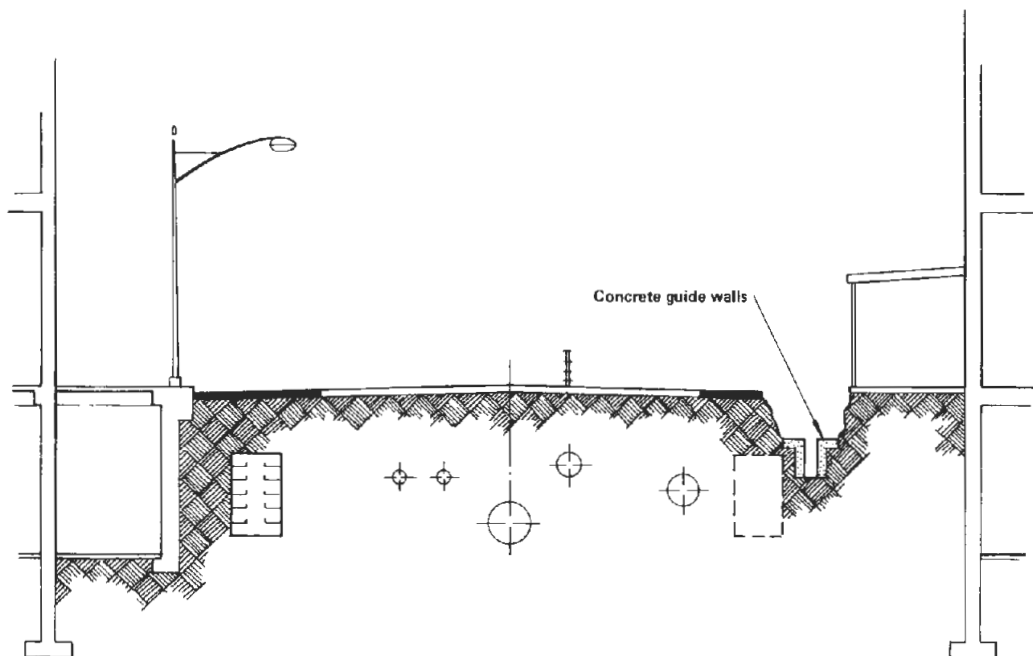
Step 5: Cut off two lanes of traffic and construct guide walls for slurry trench.
